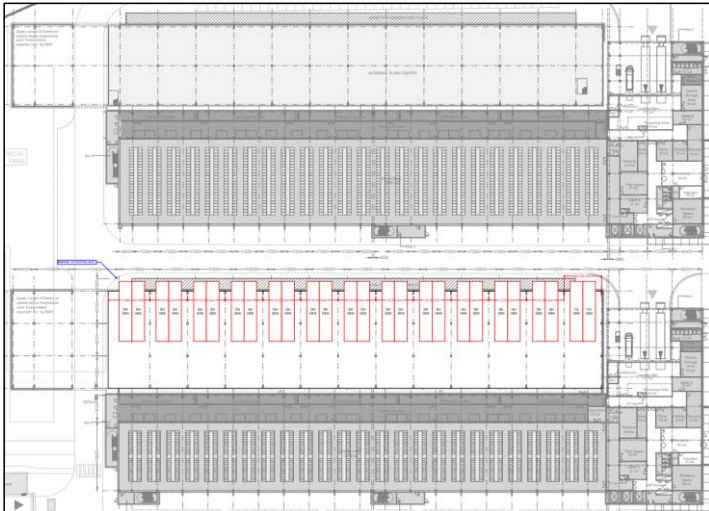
First Floor Gantry Layout (CEP Layout) – Buildings A & B
